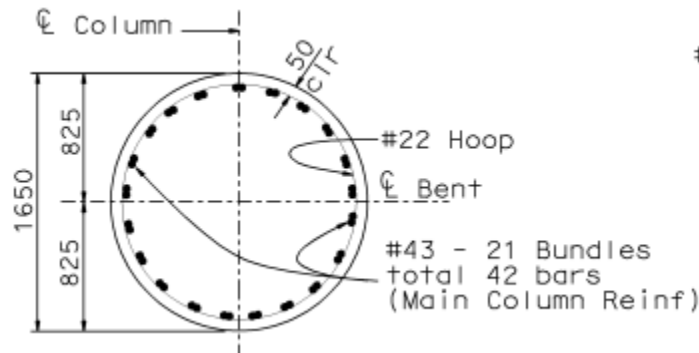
Cross-section detail of R14L bridge column (Caltrans)
